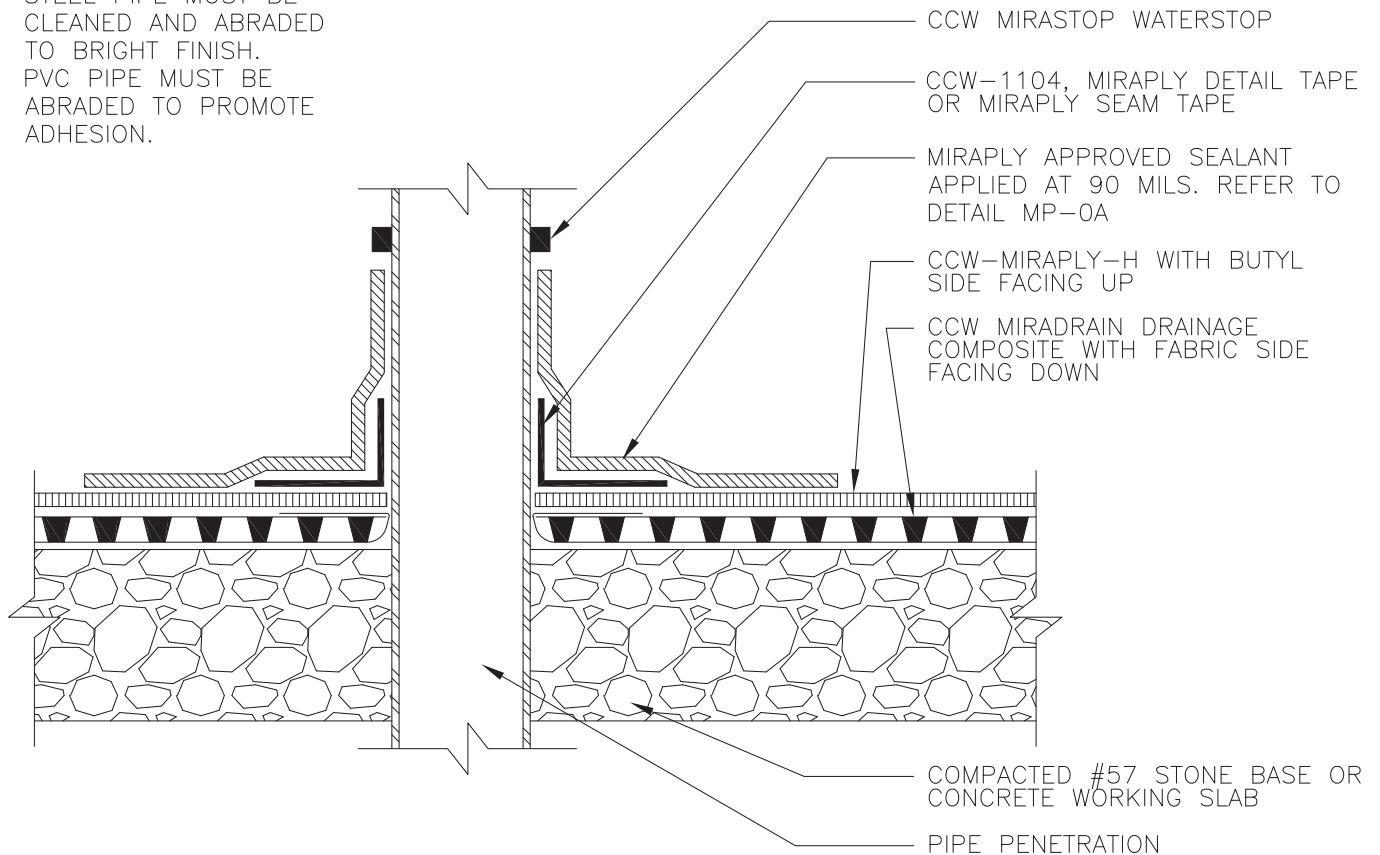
DETAIL IS INTENDED TO BE A GUIDE FOR WATERPROOFING INSTALLATION ONLY.
